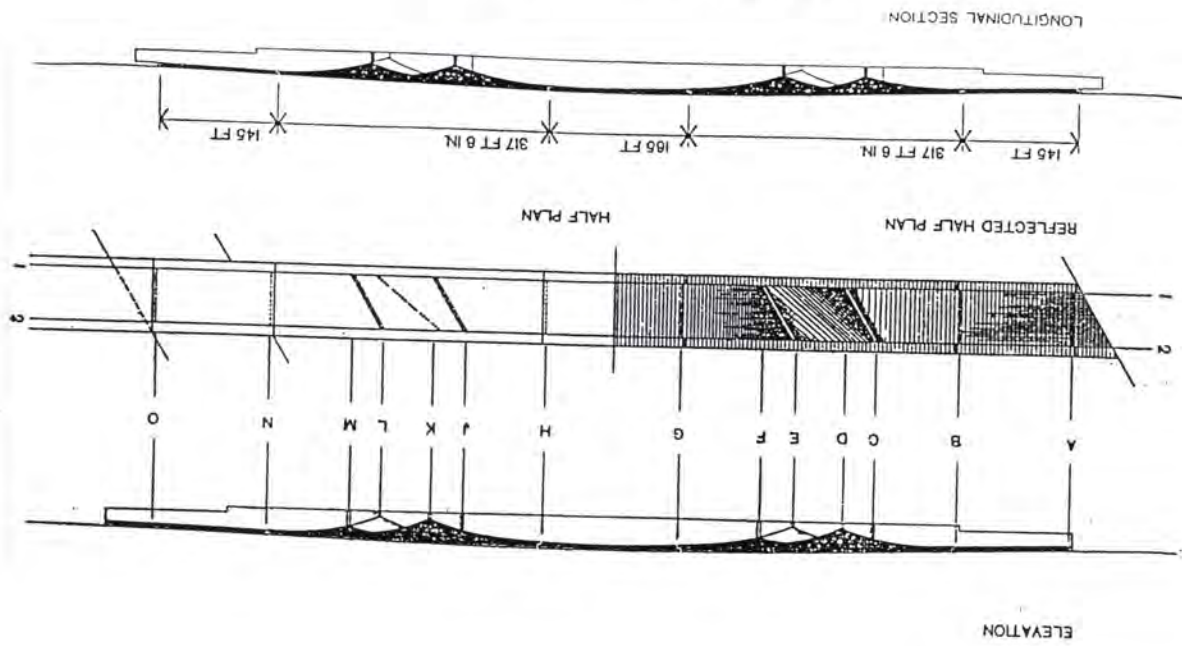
PROPOSED DESIGN FOR NARROWS BRIDGE
